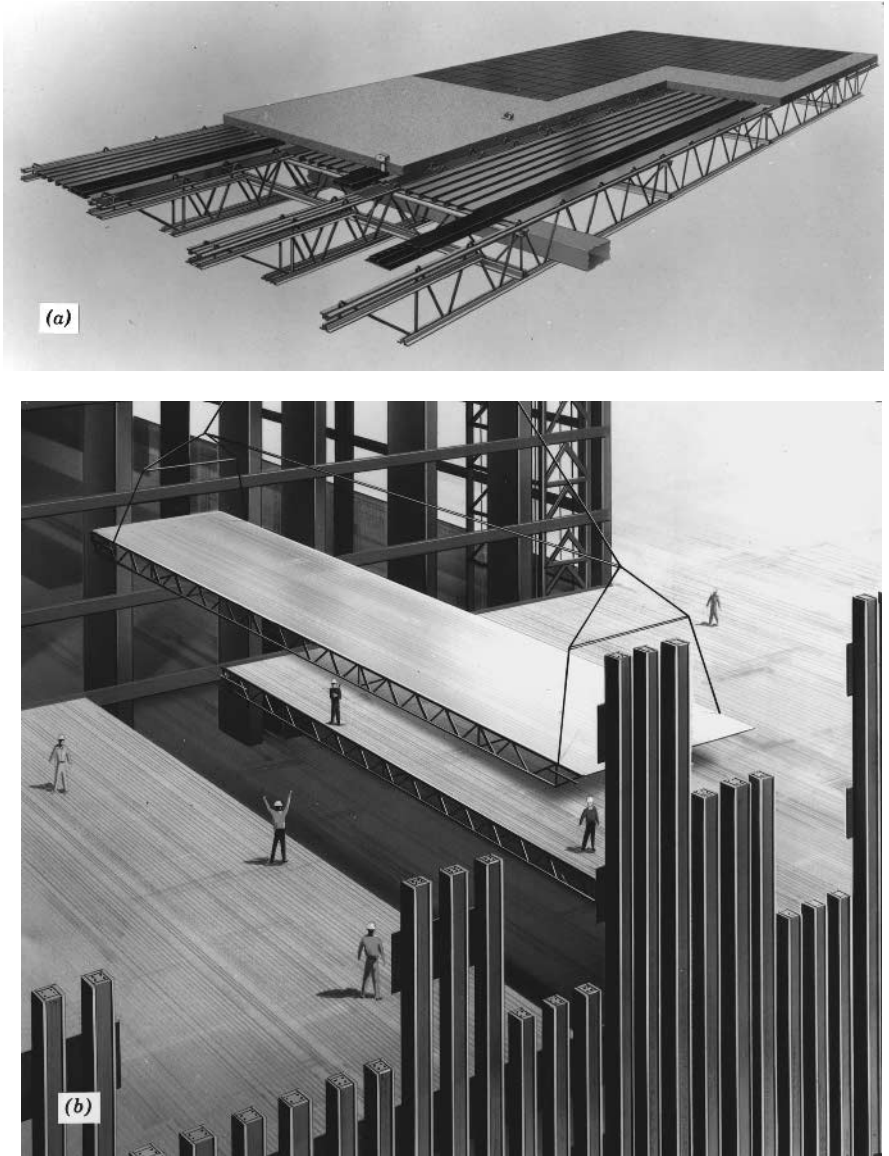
(a) Composite truss-panel system used in World Trade Center Building, New York City; prefabricated by Laclede Steel Company. (b) Placement of prefabricated composite floor panel section in World Trade Center Building. (*Port of New York Authority.*)
